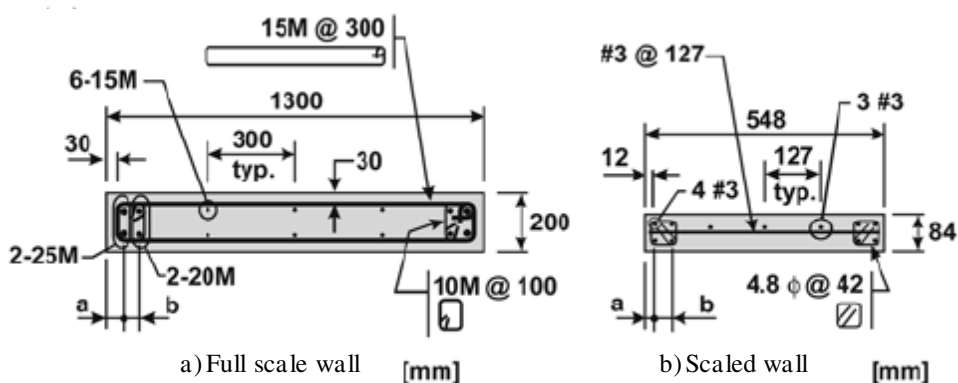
Reinforcement details of the full scale and 33% scaled wall specimens tested by Ghorbani-Renani et al. (2009)
